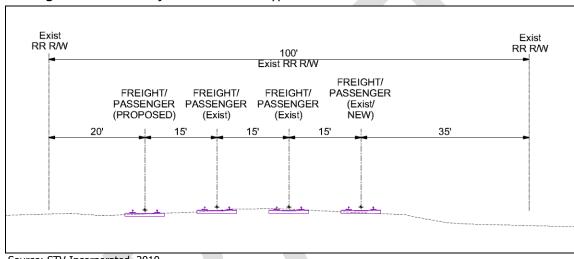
No Project Alternative – Typical Cross-Section – Hobart Yard to Fullerton
